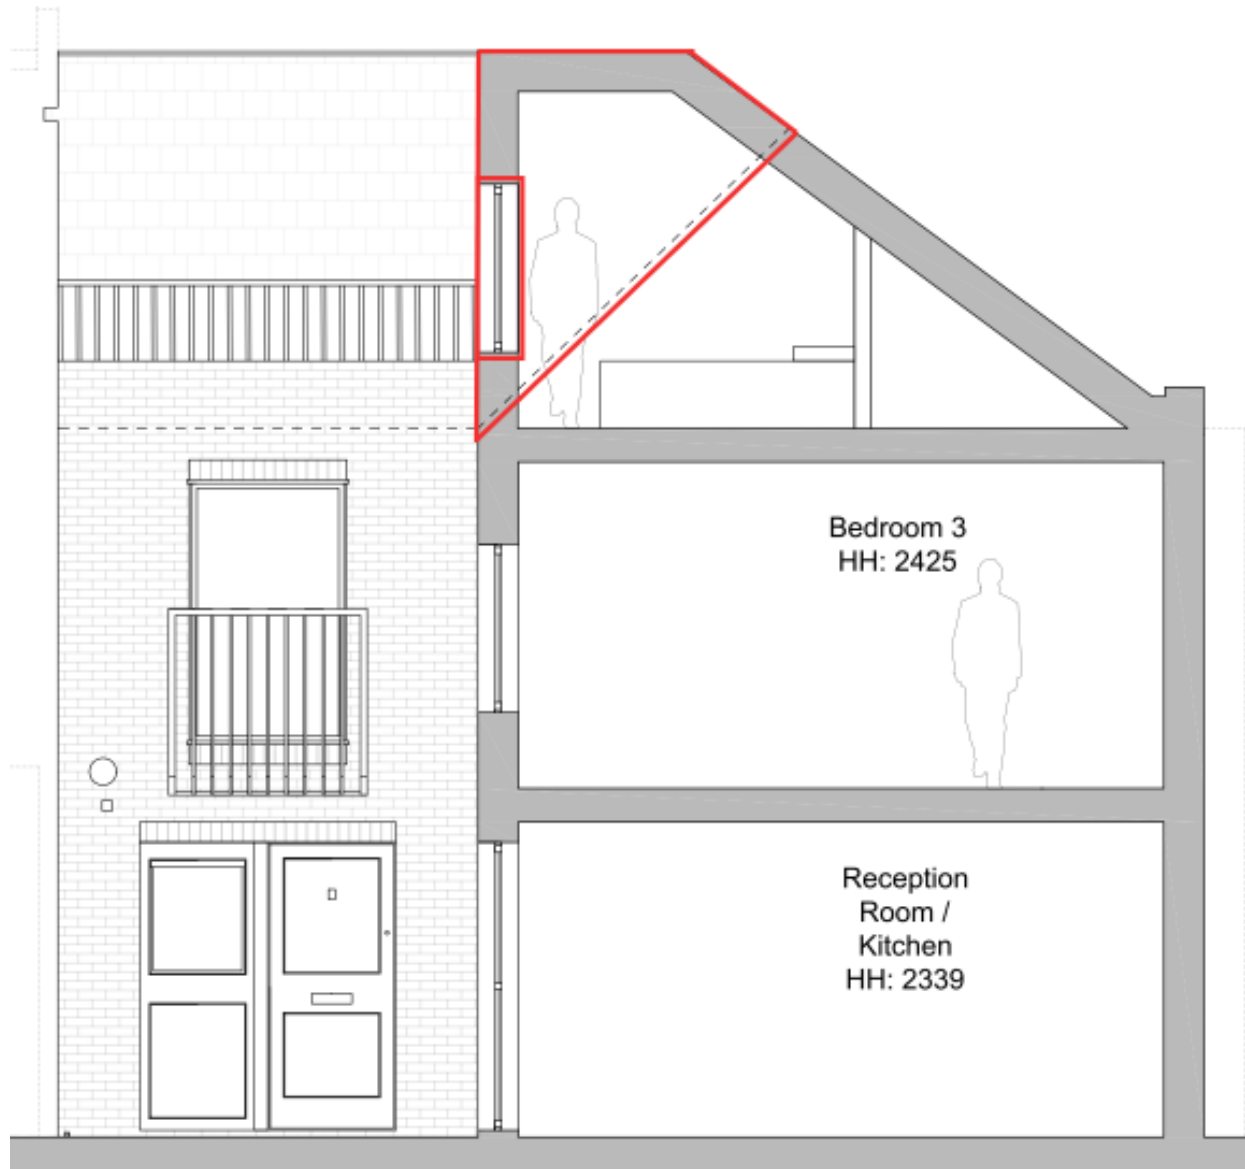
Screenshot taken from the proposed north elevation. The dotted line shows the existing pitched roof with window as proposed
